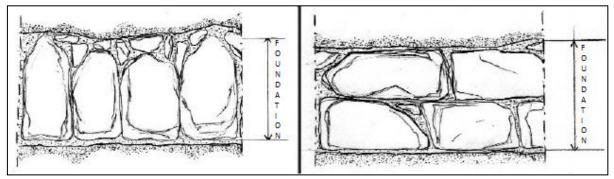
On the left, the right stone positioning, on the right the wrong one (figure from "Manual for the construction of dry walls" in Cinque Terre, 2004).
